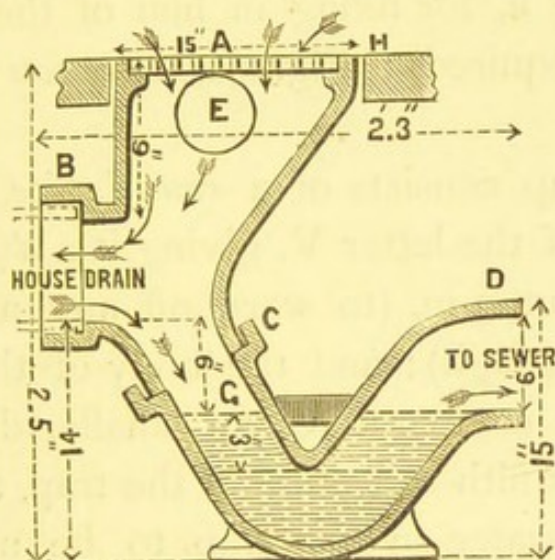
Vertical Section of a 6 in. "Ventilating Drain-syphon," &c.
